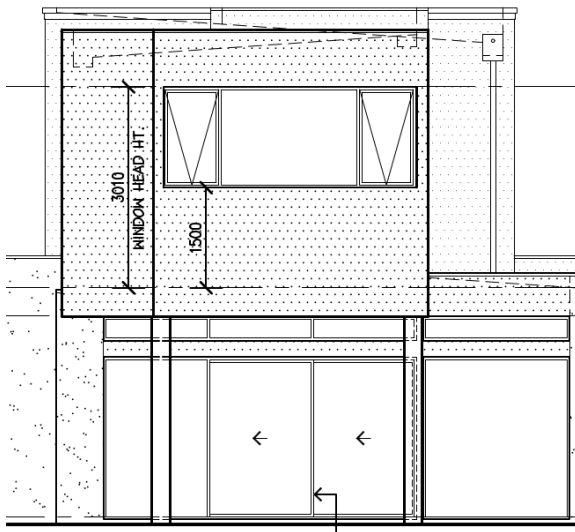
Sill height of window to Master Bed as portrayed on north elevation
